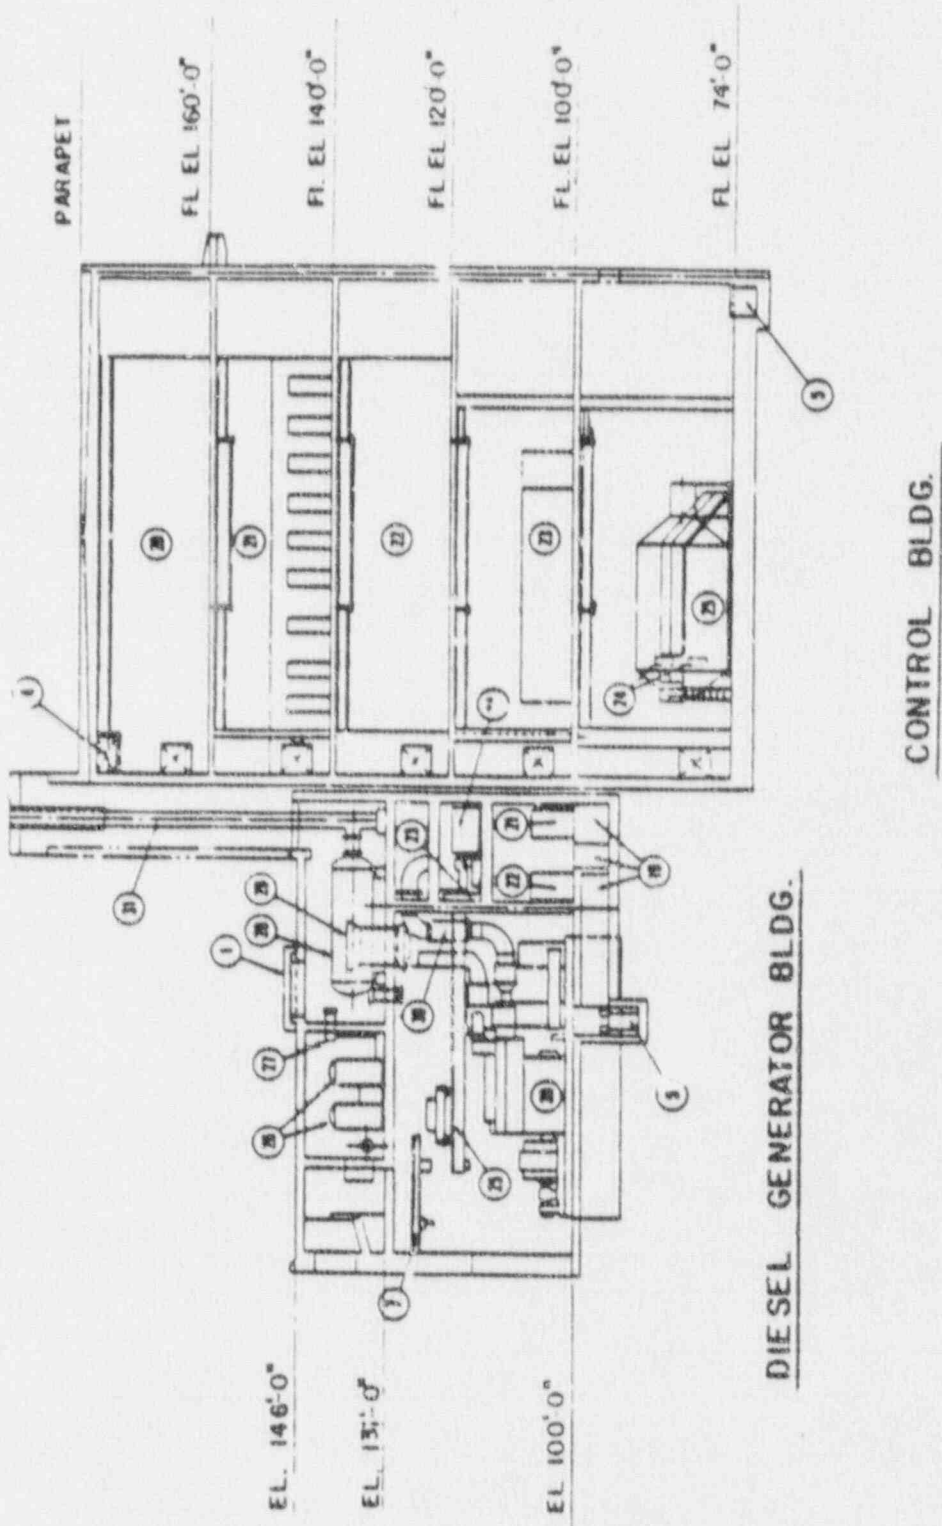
Elevation View of the Control and Diesel Generator Buildings at Palo Verde
